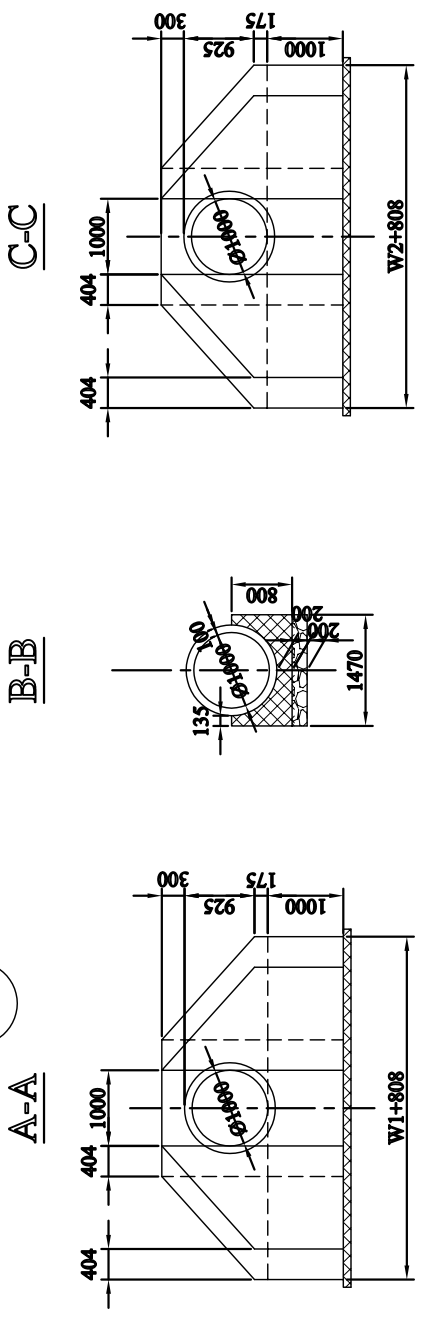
General View of Pipe Culvert (Type "A" =1000)
